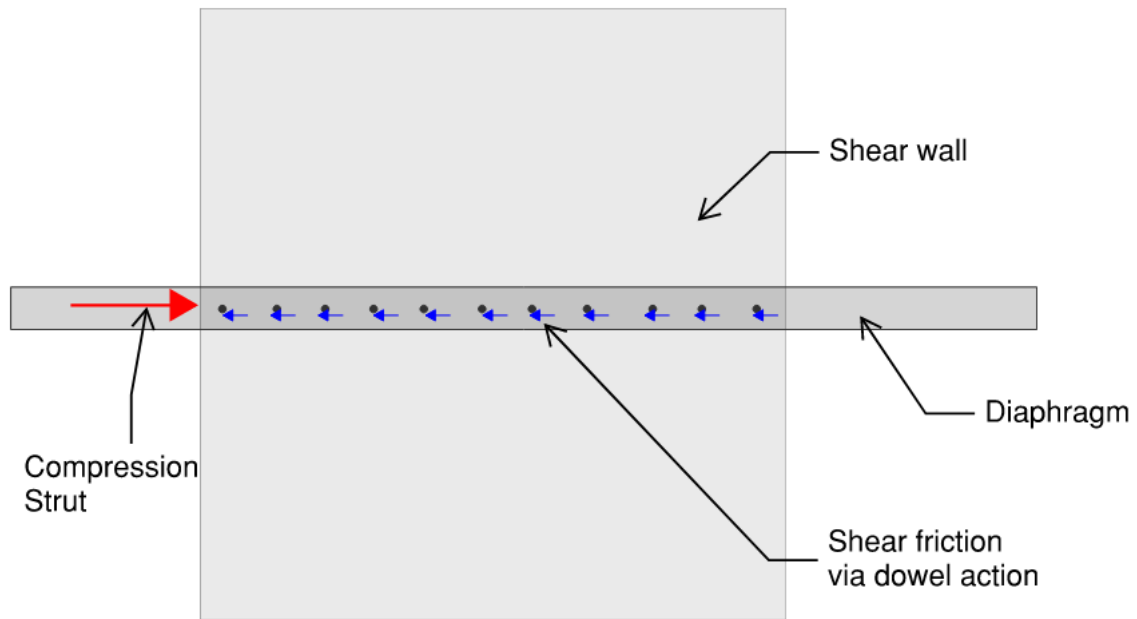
Shear wall elevation showing the load transfer mechanism
